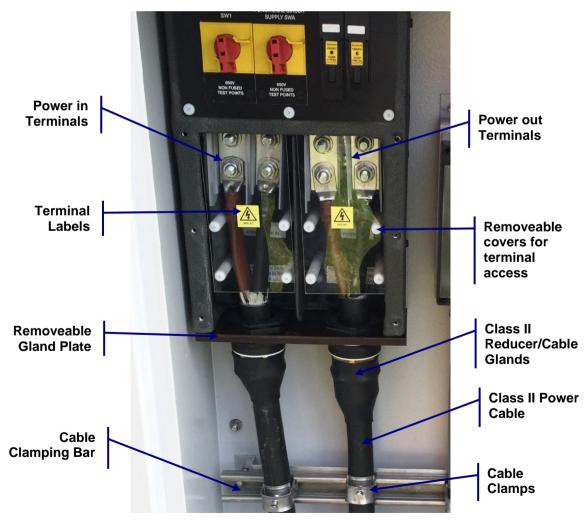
Power In/Out Terminal Arrangement (2-core version)
